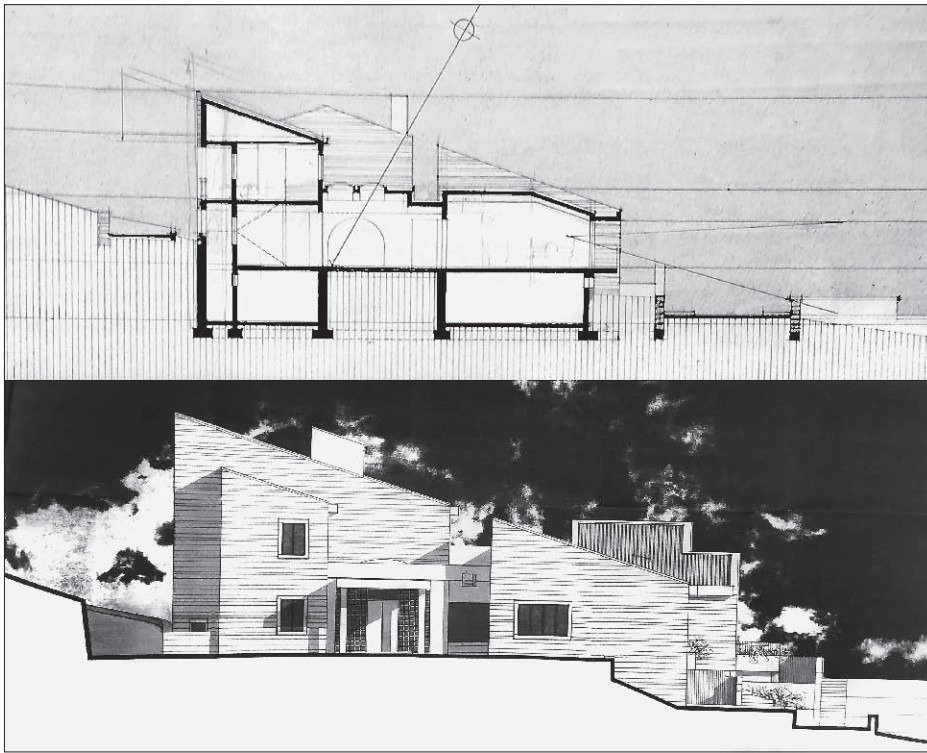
A-A SECTION (TOP) AND WEST ELEVATION (BOTTOM) OF THE PRESIDENTIAL VILLA IN MILOČER
